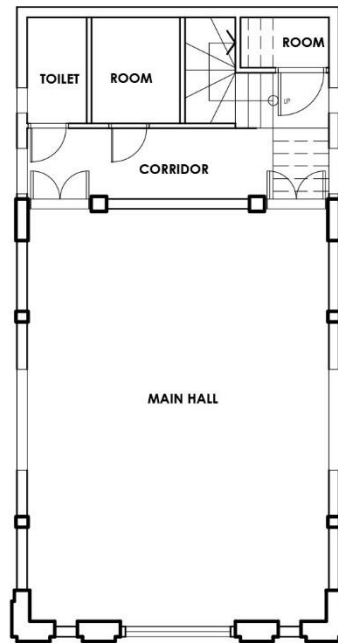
26 First floor plan of Tio Chew Old Office of Cemetery Affairs.
